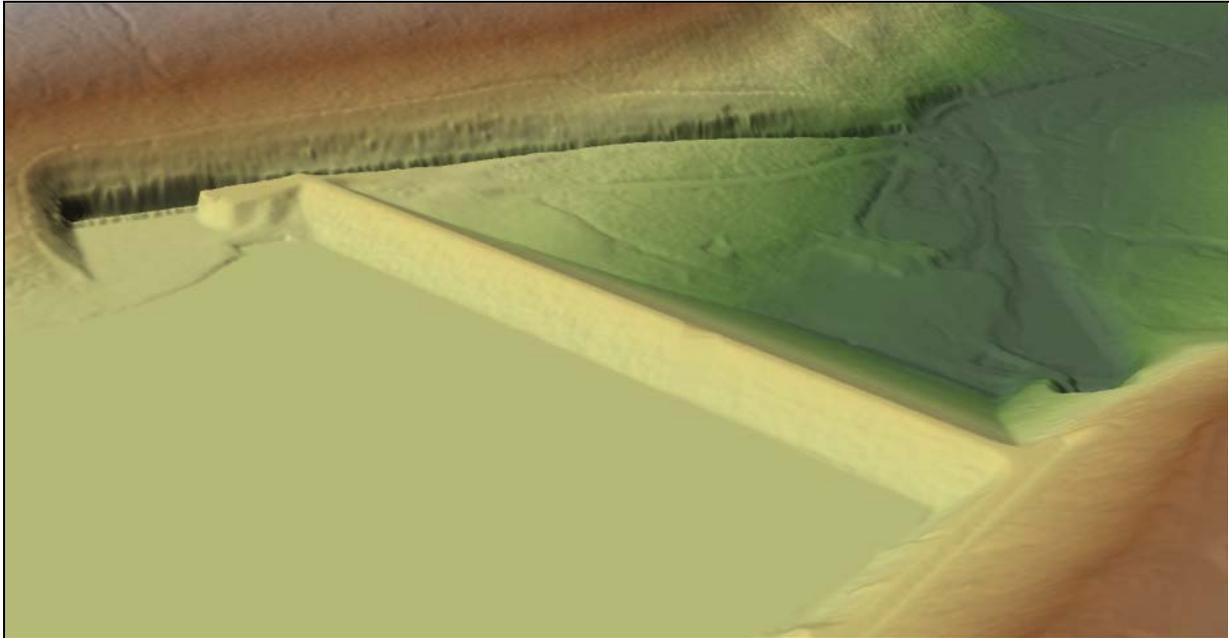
Isometric view above the East Branch Clarion River Dam & Spillway.
